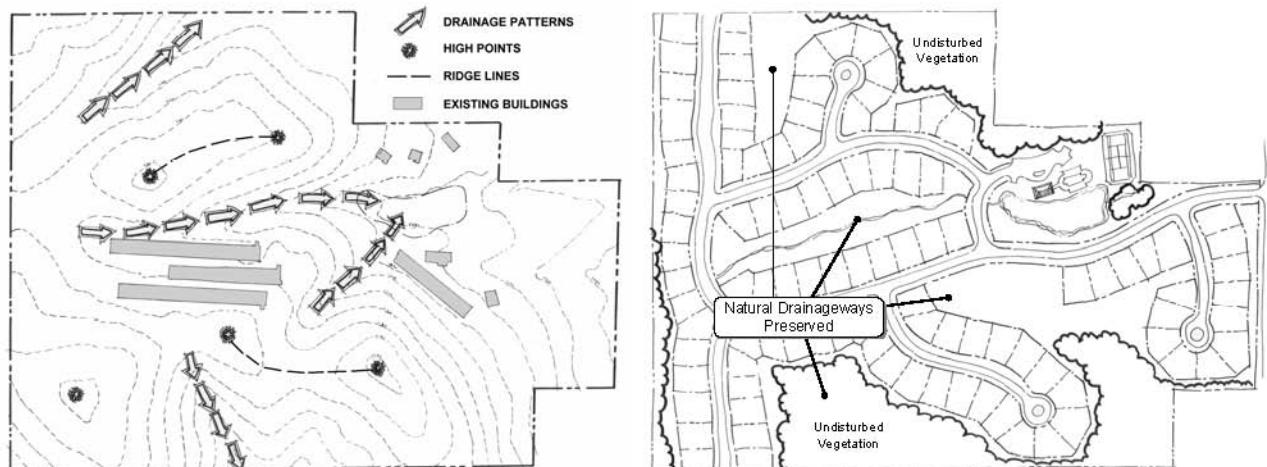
Example of a Subdivision Using Natural Drainageways for Stormwater Conveyance and Management
